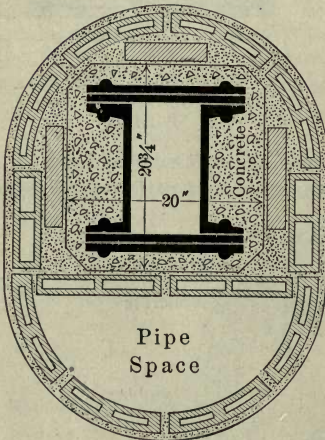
Hollow Tile Column Casing and Pipe Chase, Adams Building, Chicago.
